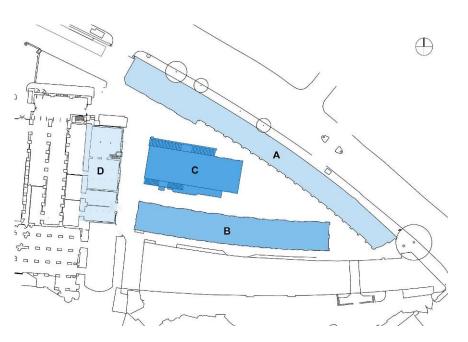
Stables Market -Listed group of buildings, subject site Building D.
